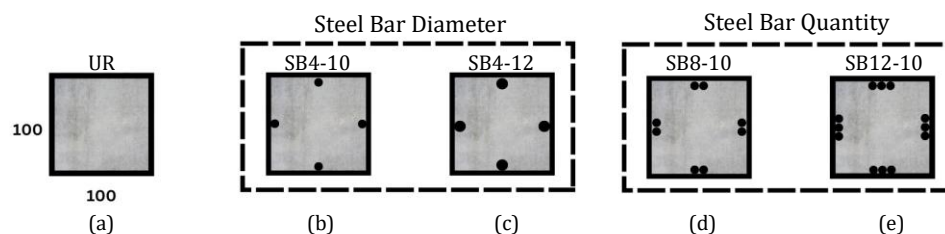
Cross-sectional configurations of the tested square CFST specimens: (a) Group A: unreinforced control specimen; (b)-(c) Group B: reinforced specimens with 10mm and 12mm diameter; (d)-(e) Group C: Specimens reinforced with 8 and 12 steel bars.
